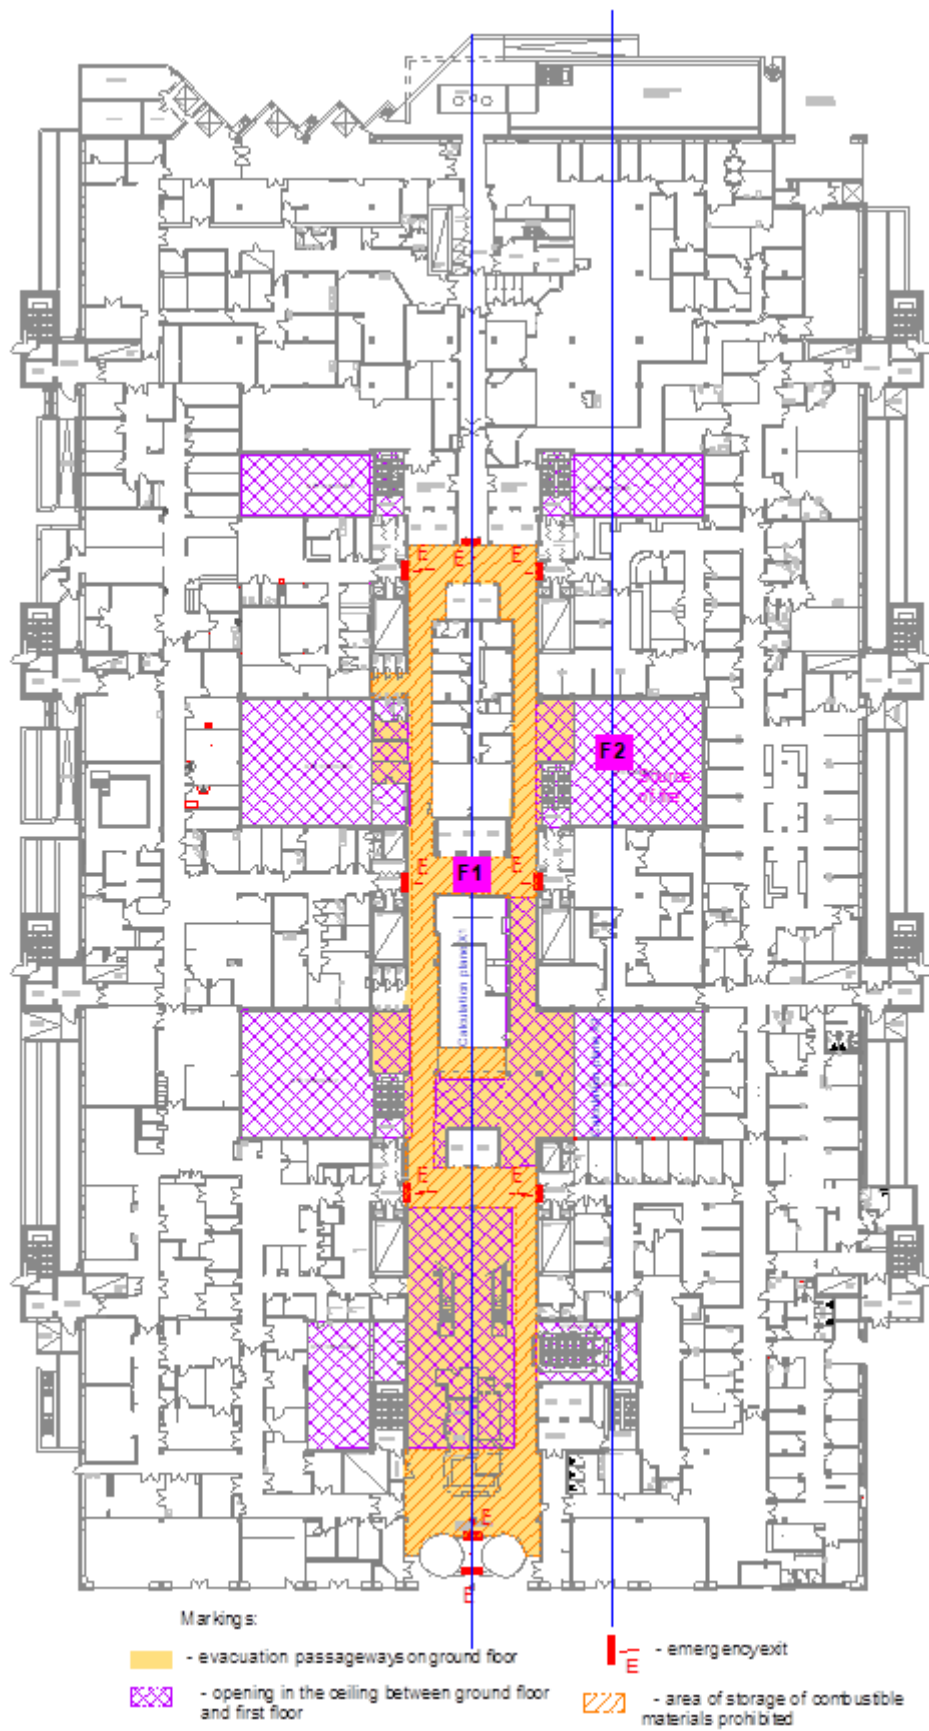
Hospital – Ground floor plan and design fire locations F1 and F2.
